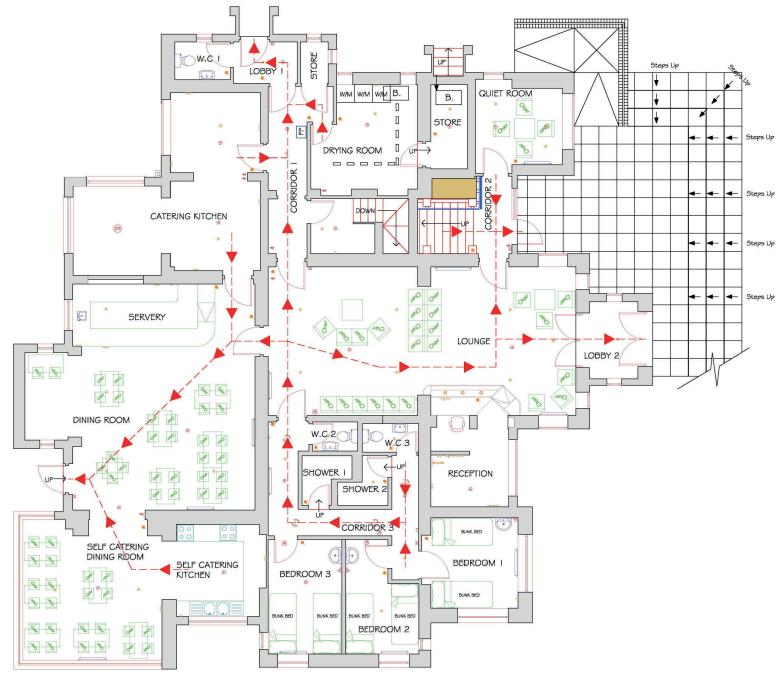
YHA Windermere - Ground Floor Fire Plan (YHA Windermere, 2009)
